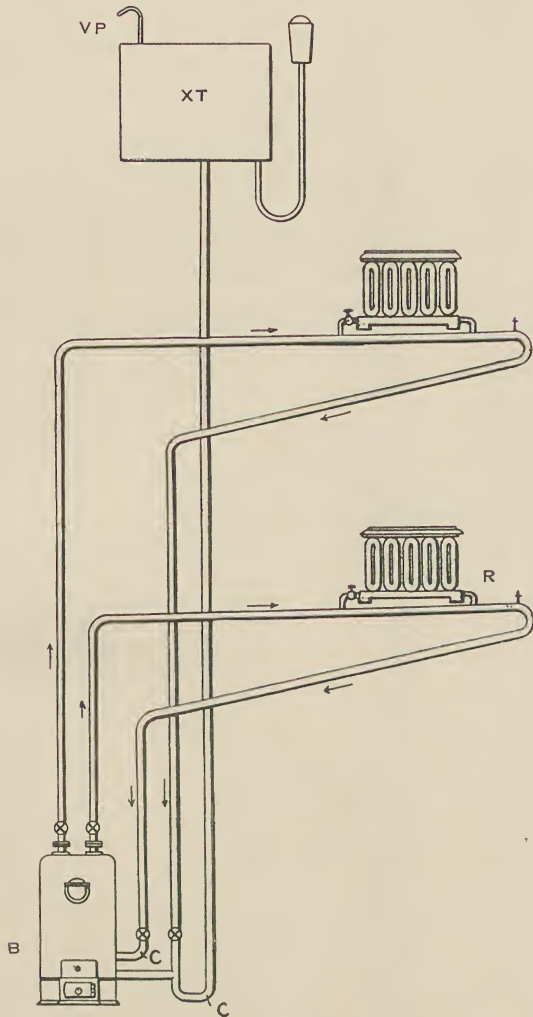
Elevation of Low-pressure Hot-water Apparatus, with Separate Circuit for Each Floor.
